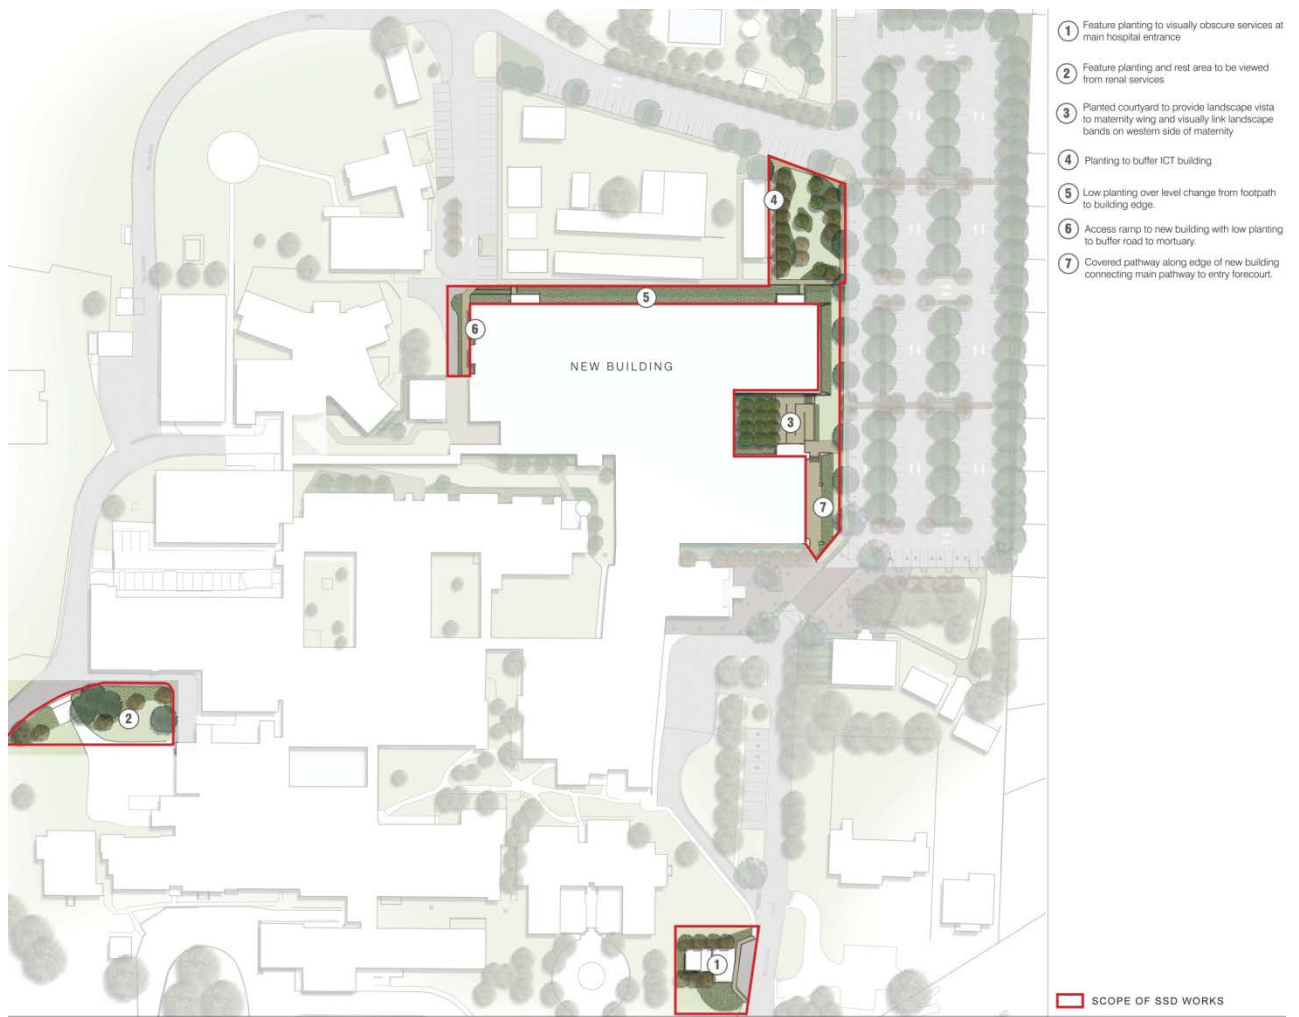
Dubbo Base Hospital - Preliminary Landscape Plan (Oculus)
